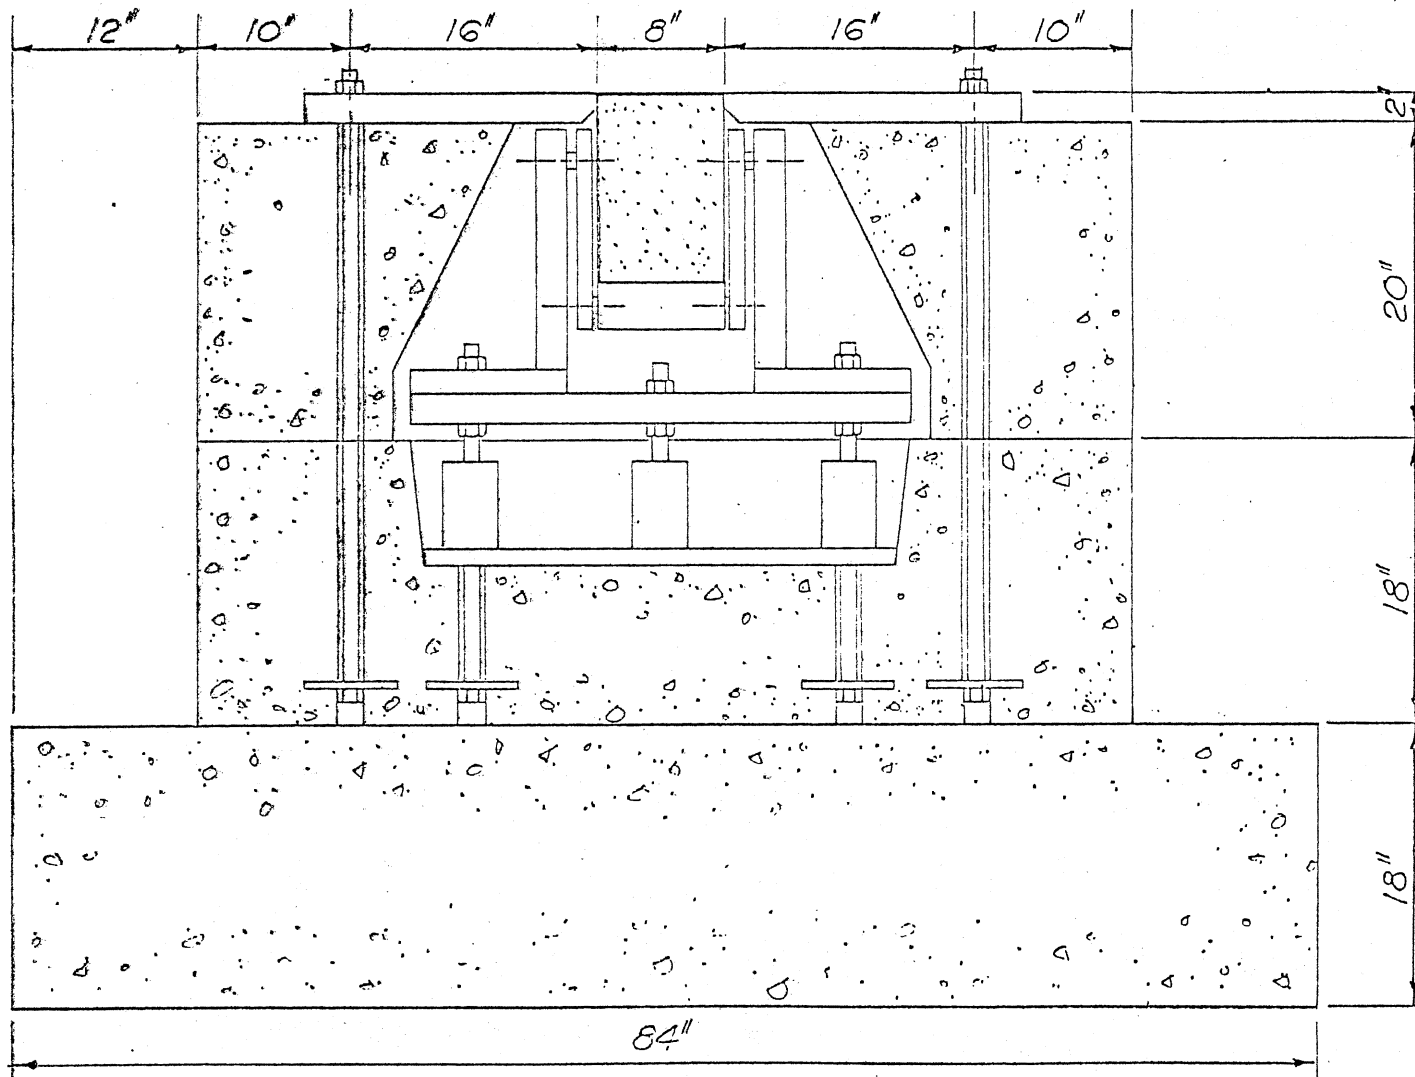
Cross Section Through End of Test Fixture With Top Plates, Beam Support Mechanism, and Load Cells in Place
